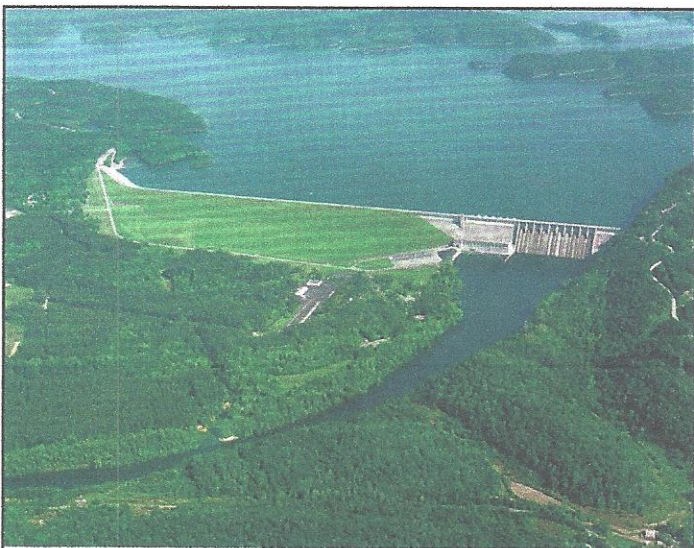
Aerial View of Wolf Creek Dam showing the concrete gravity section (including powerhouse) on the left abutment and the embankment section to its right (Source: USACE)
